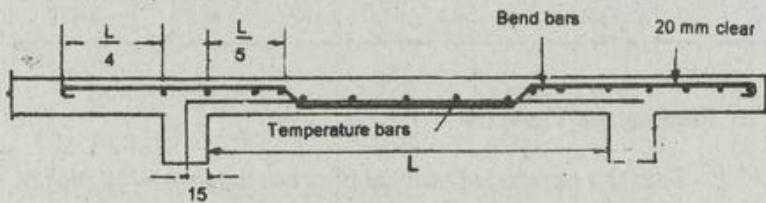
ONE WAY SLAB REINFORCEMENT
